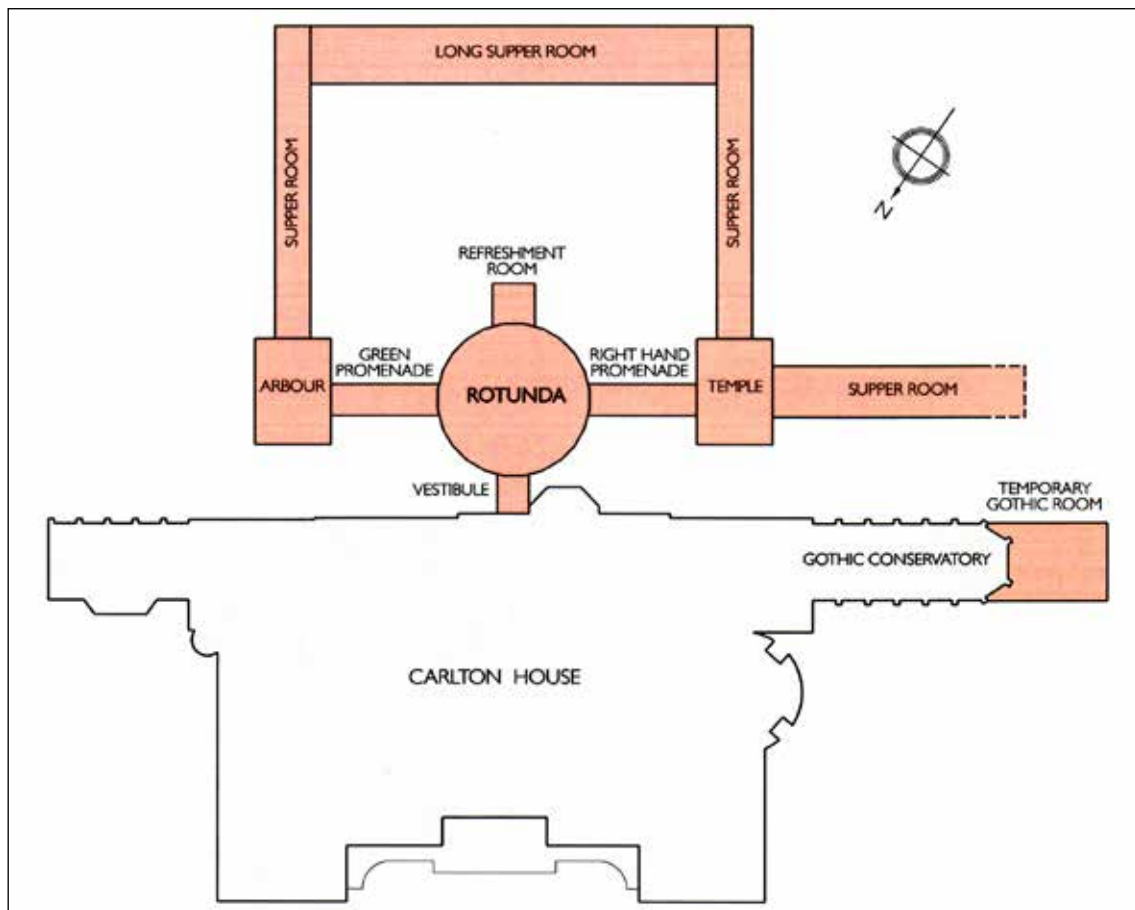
Reconstructed plan of the temporary structures built in the gardens at Carlton House, including the Rotunda, first used for the Wellington Fête of 21 July 1814. (© Emily Cole/Andy Donald, Historic England)
